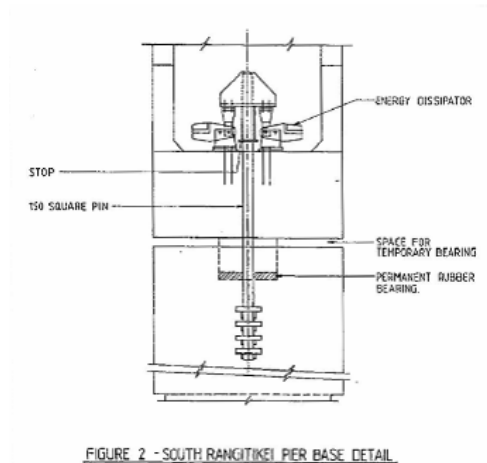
SOUTH RANGITIKEI PIER BASE DETAIL
